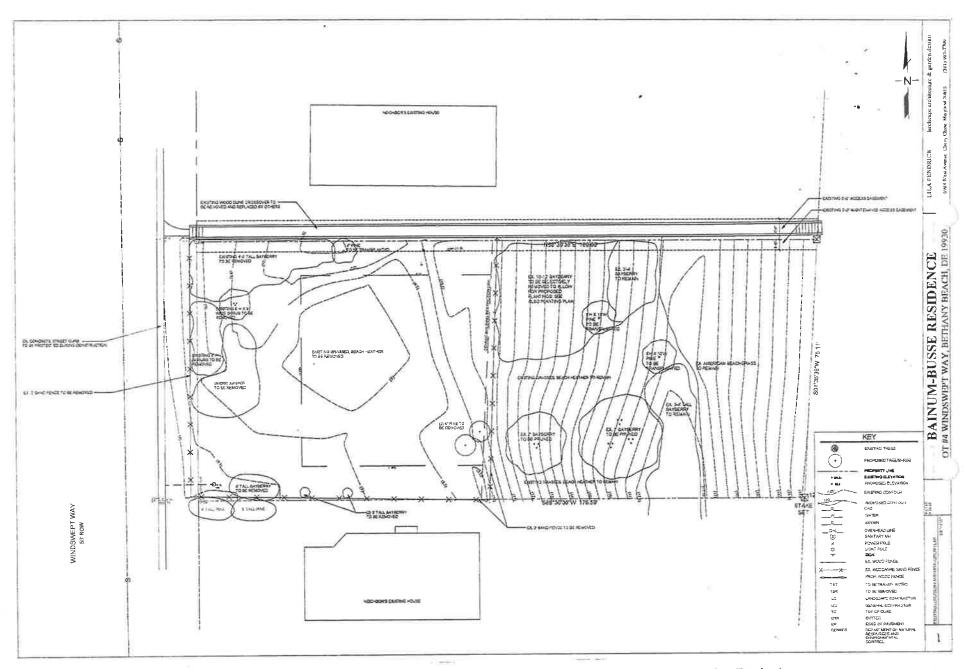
Landscaping plan (prepared by Lila Frederick, Landscape Architecture and Garden Design).
